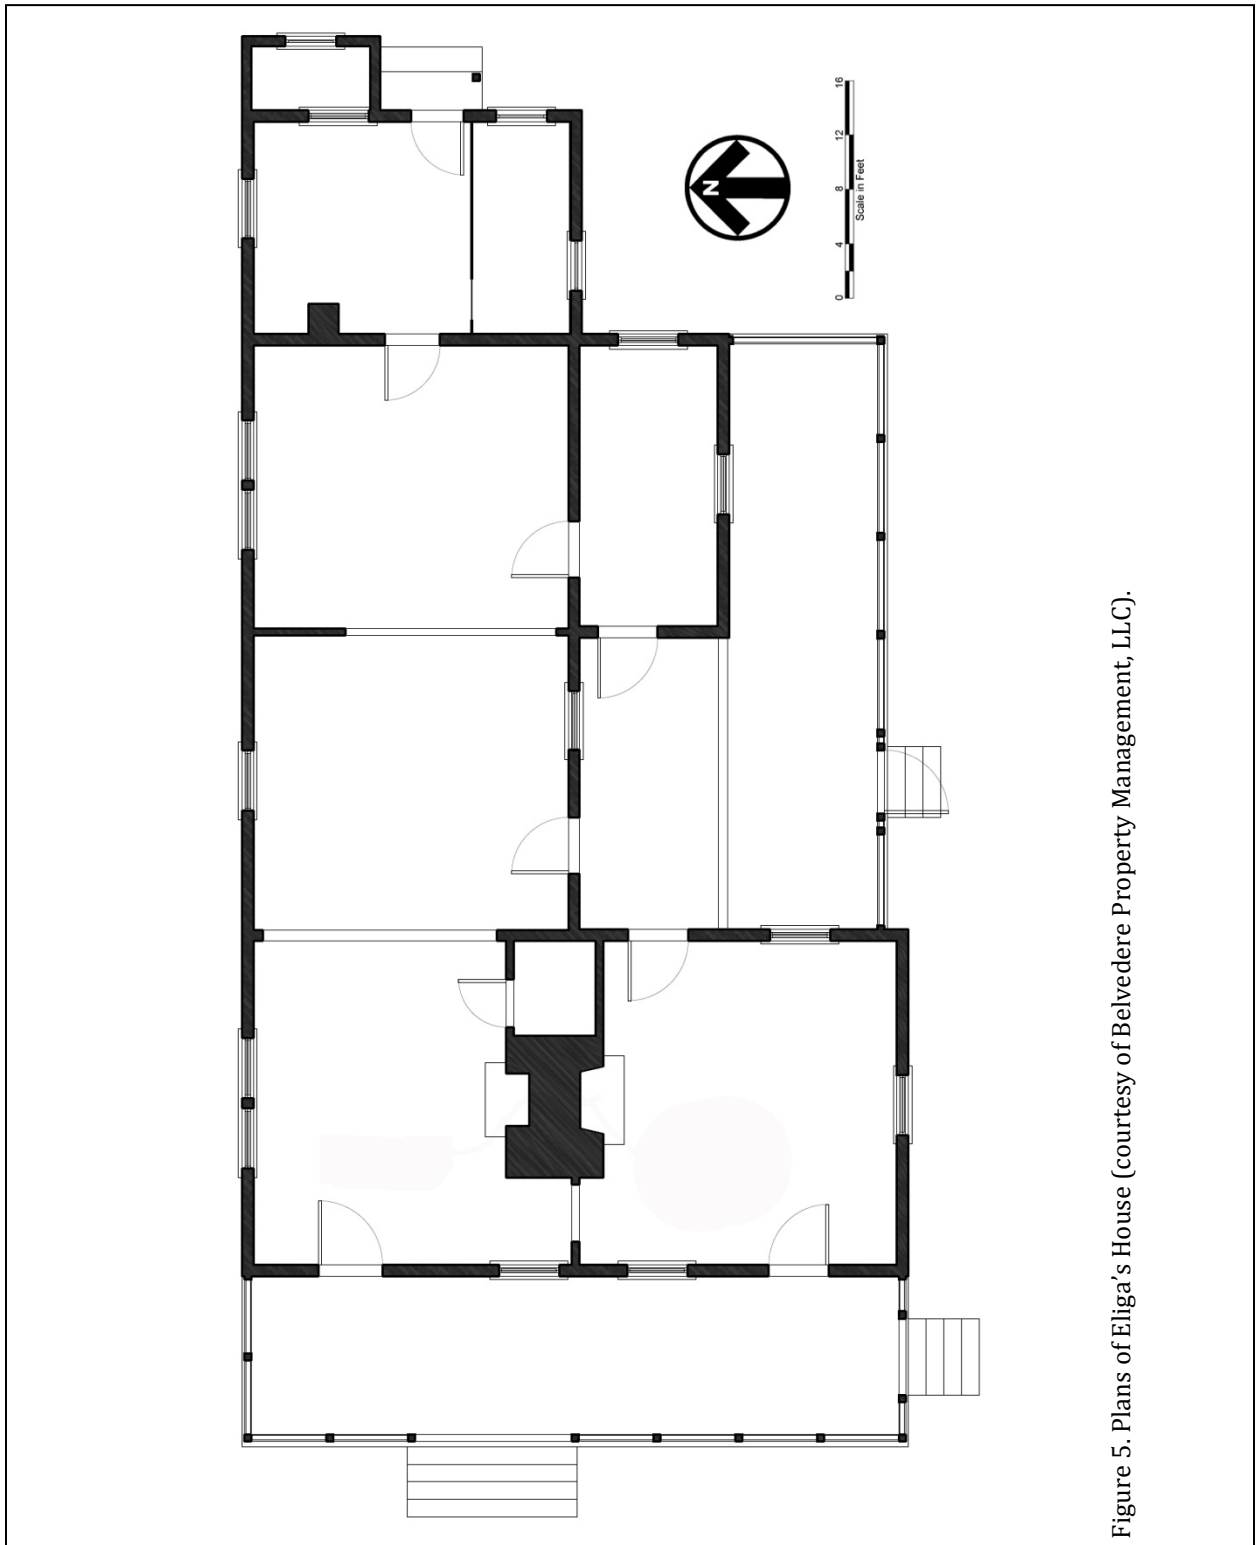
Plans of Eliga's House (courtesy of Belvedere Property Management, LLC).
